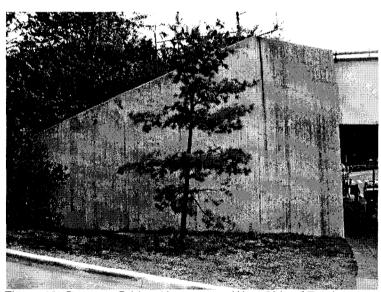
Concrete Bridge Abutment on West Side of Tracks
